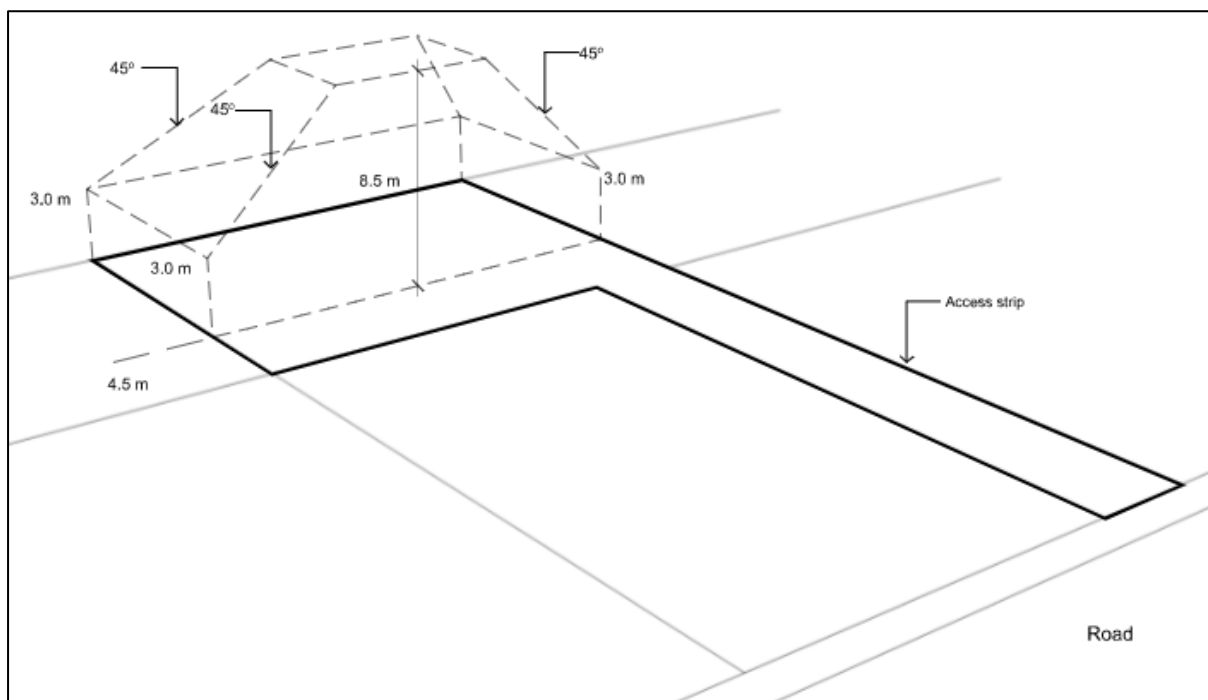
Building envelope for internal lots as required by 8.4.2 A3(a)
